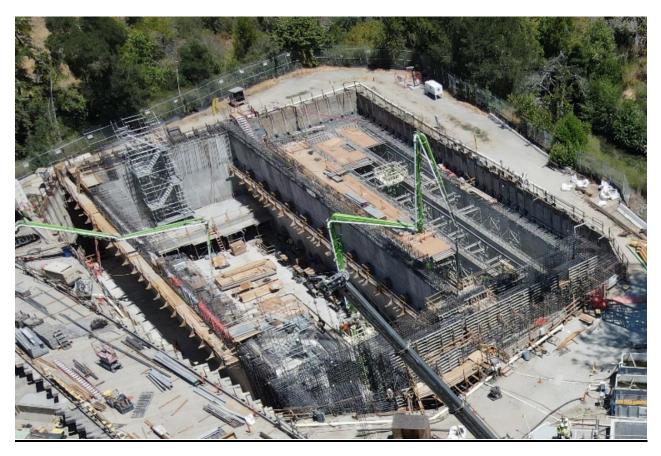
Concrete placement via concrete pump truck for the last 25-foot tall walls for the CCB.
